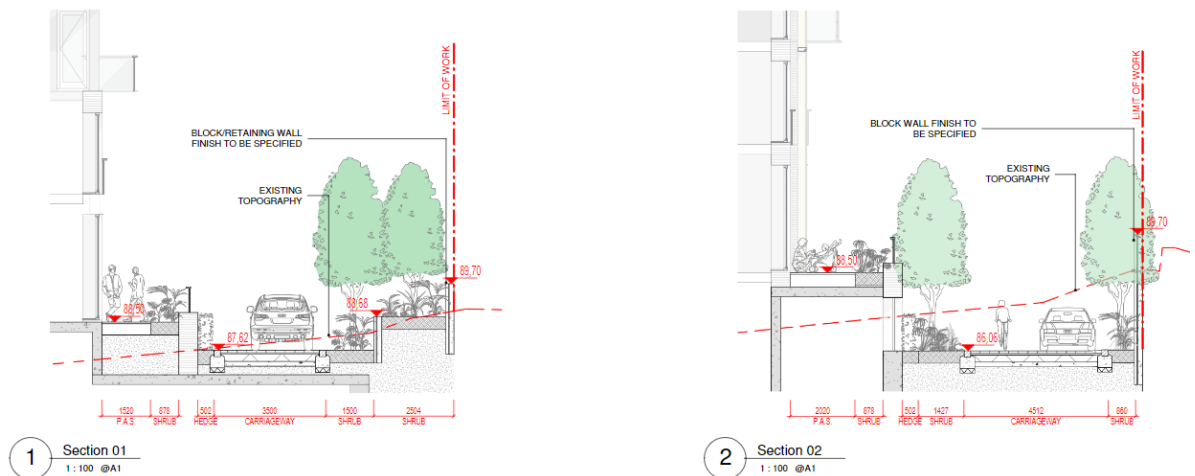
Extract from cross-section of access road drawings by NMP Landscape Architects
